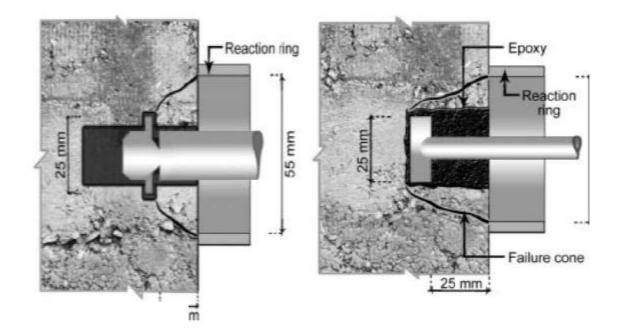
(a): Pull-out Test (b):CAPO test (ACI 228.1R-03)
